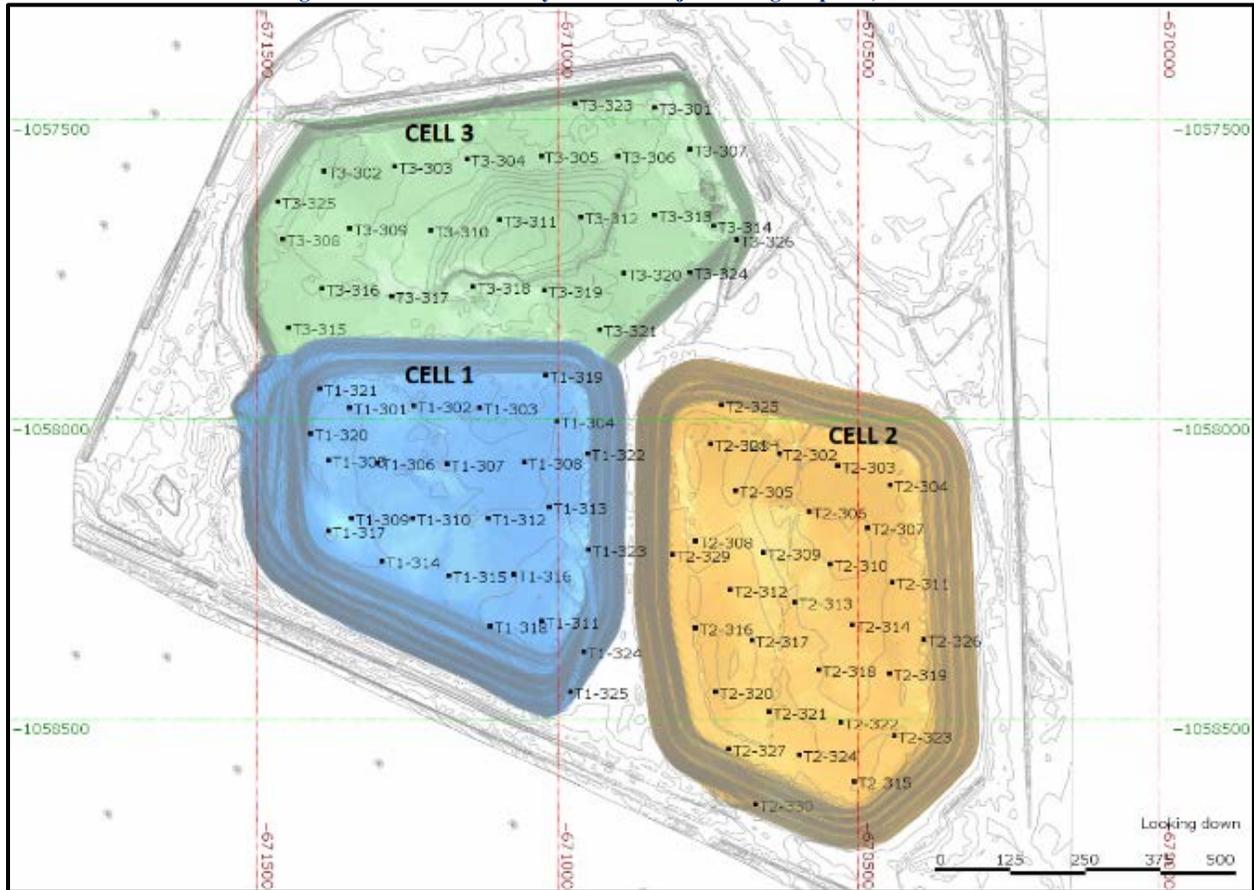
Plan Layout of the Project Tailings Deposits, Cells 1 to 3
